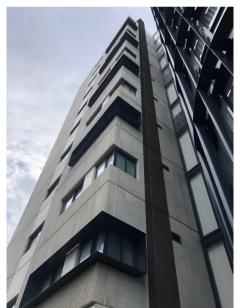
Photomontage of proposed mechanical ventilation location on Building 5A
